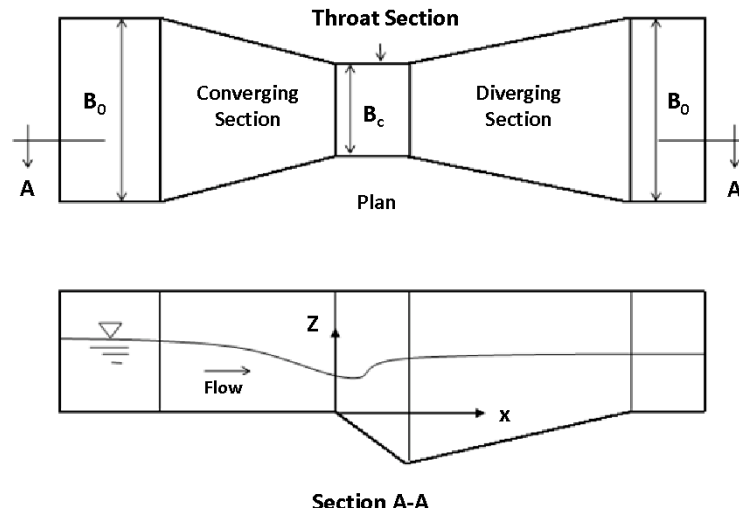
SHOWING A PARSHALL FLUME IN PLAN AND SECTION.
